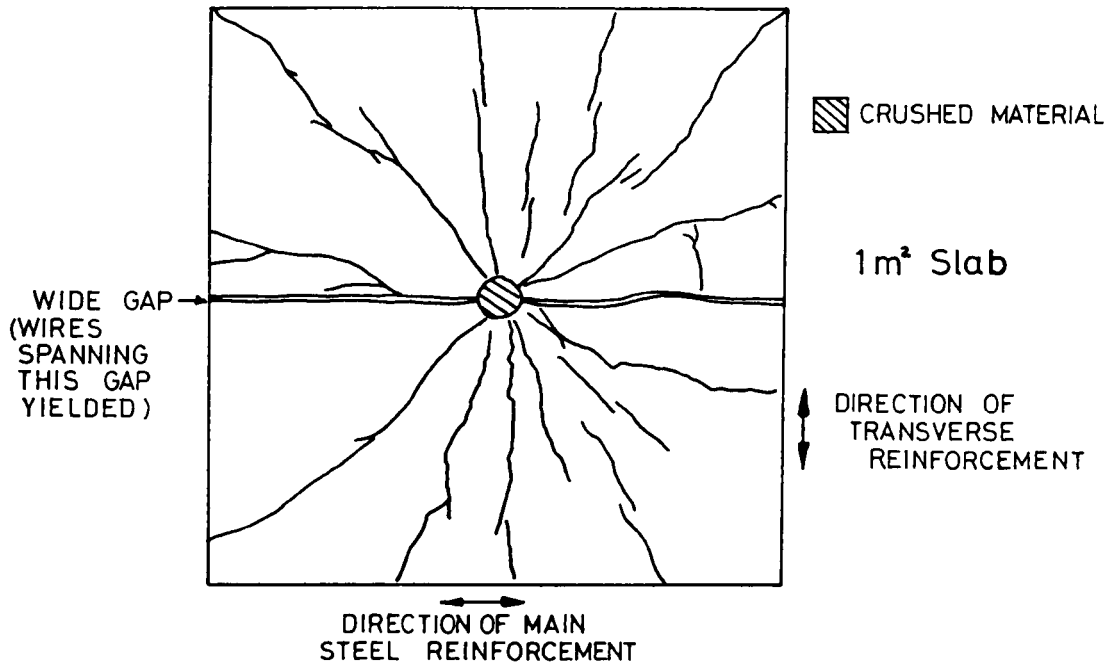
CRACKS IN A REINFORCED SAND/GRAVEL CONCRETE SLAB BY A 16g CHARGE IN CLAY
